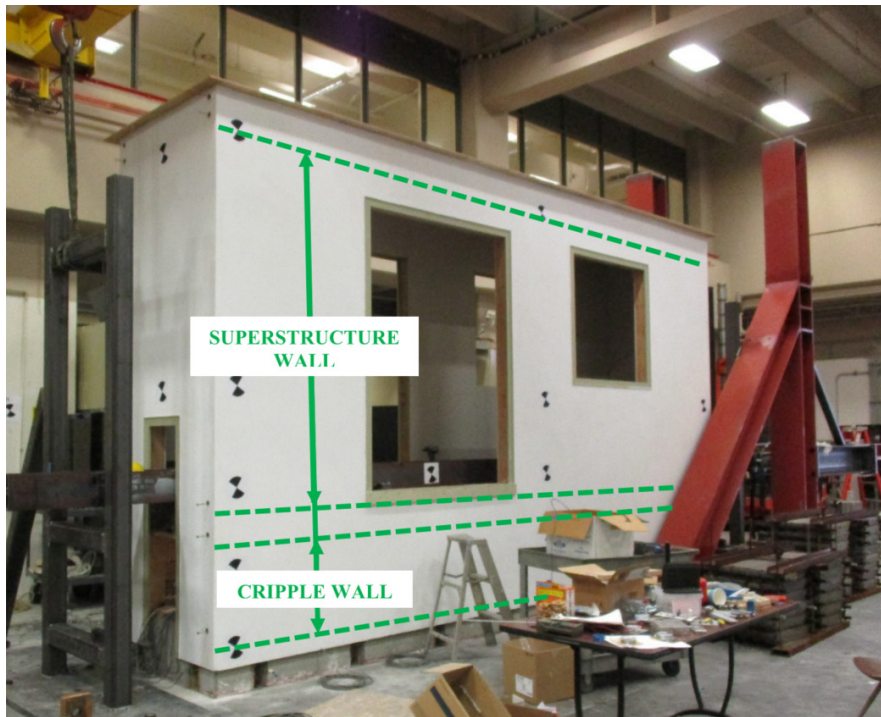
Specimen AL-1 prior to start of testing; figure shows superstructure wall above and cripple wall below; source: Figure 3-1 from Large-Component Seismic Testing for Existing and Retrofitted Single-Family Wood-Frame Dwellings
